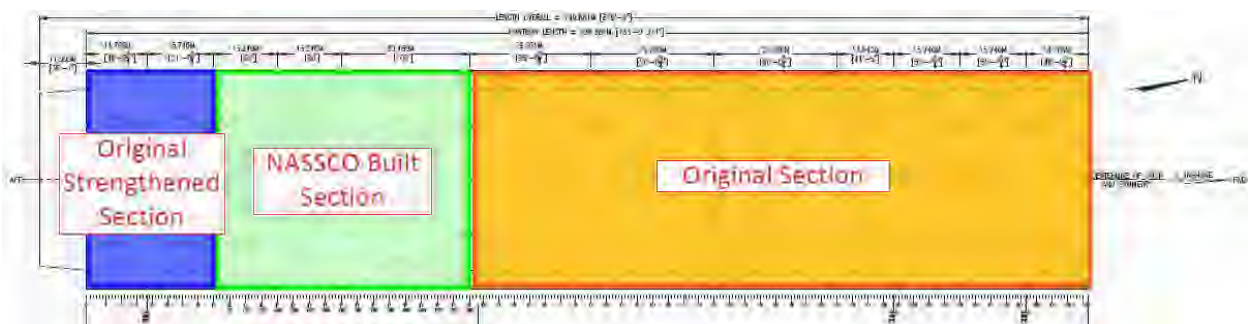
PLAN VIEW OF BUILDER FDD
